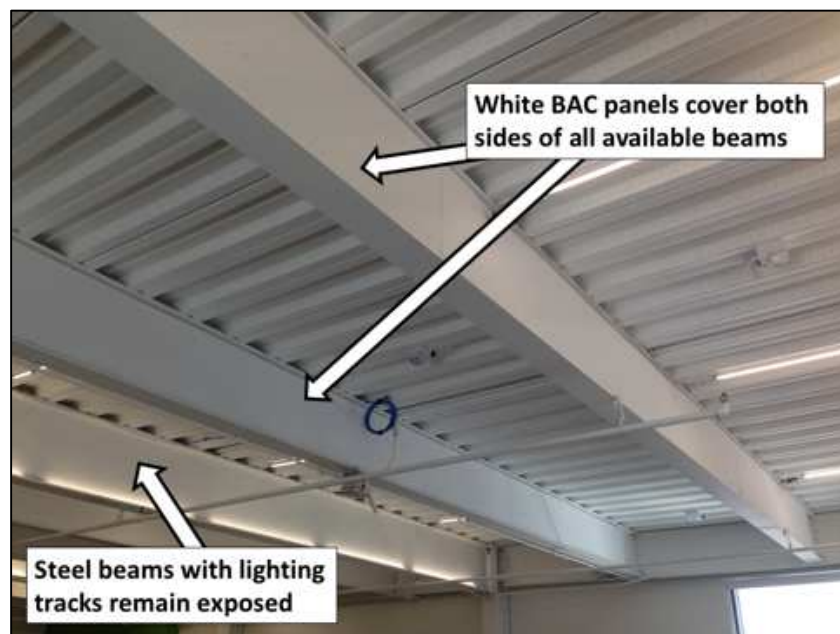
First floor classroom 39% BAC treatment. BAC panels cover both sides of beams where lighting or wiring would not interfere.
